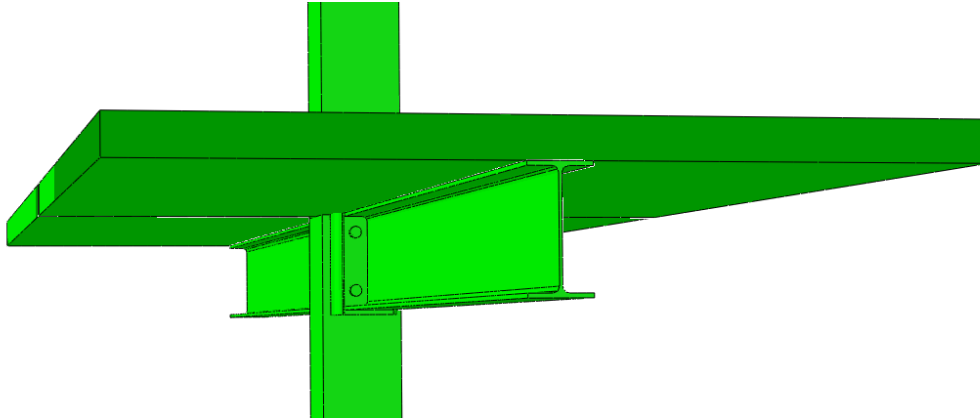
FE-Model of the sub-frame with the concrete deck as a shell.
